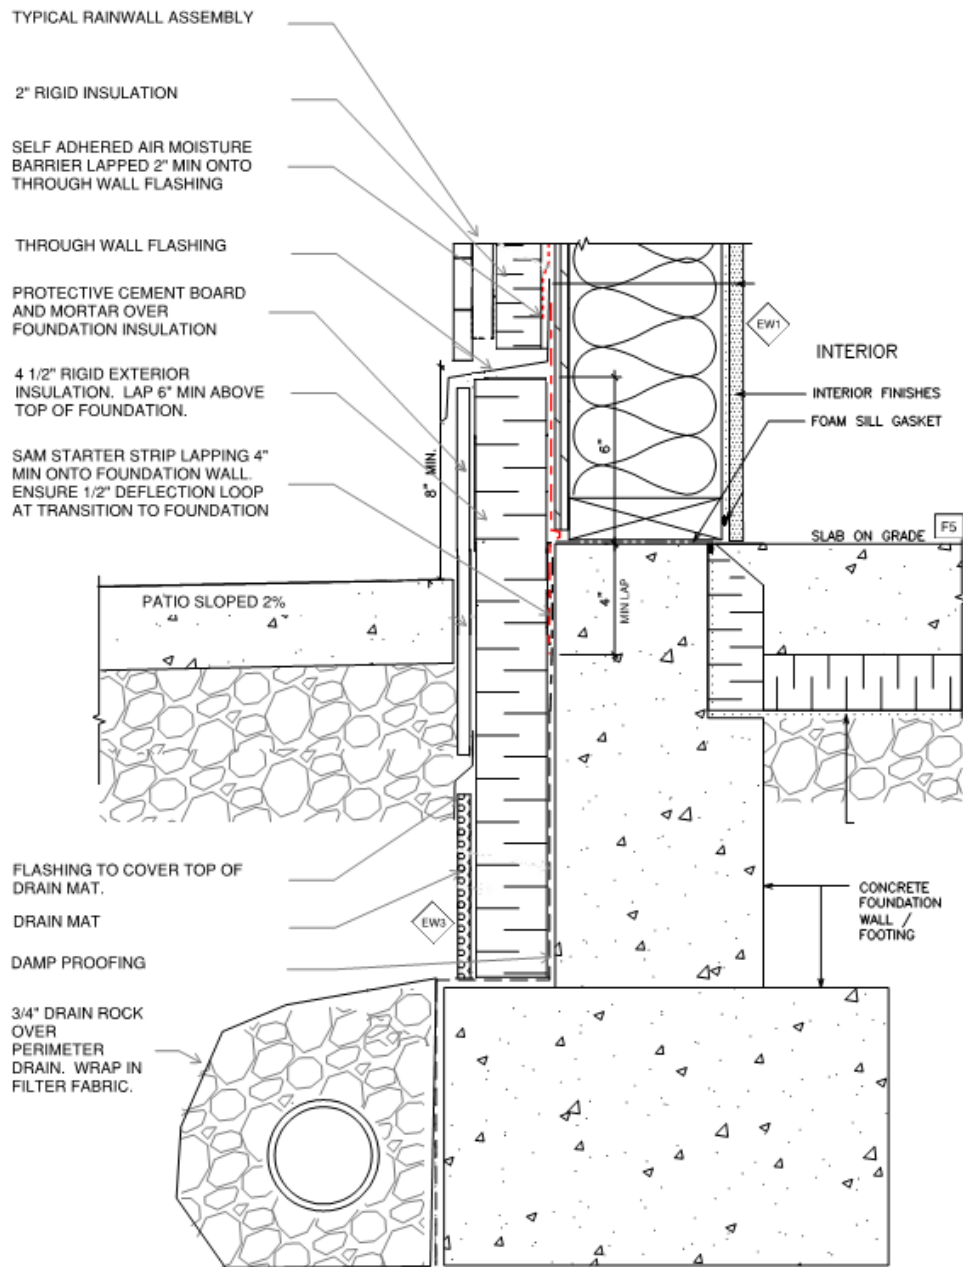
ABOVE CODE BASE OF WALL AT FOUNDATION
